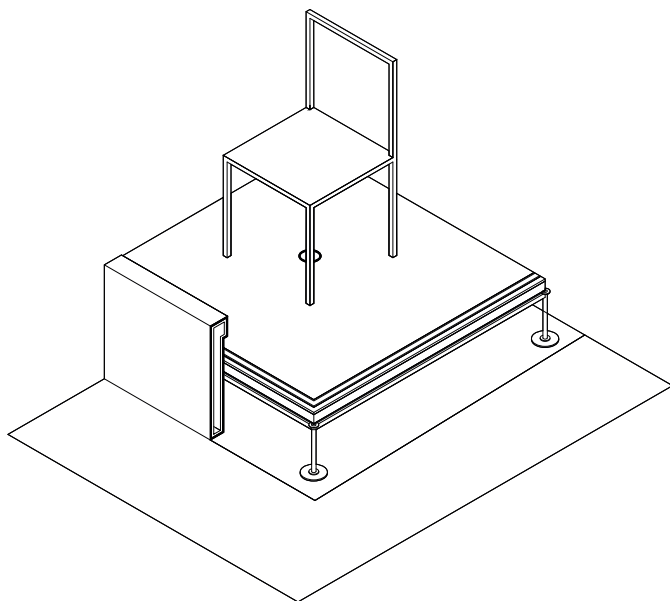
Construction detail - Display platform structure | Axonometric view.
